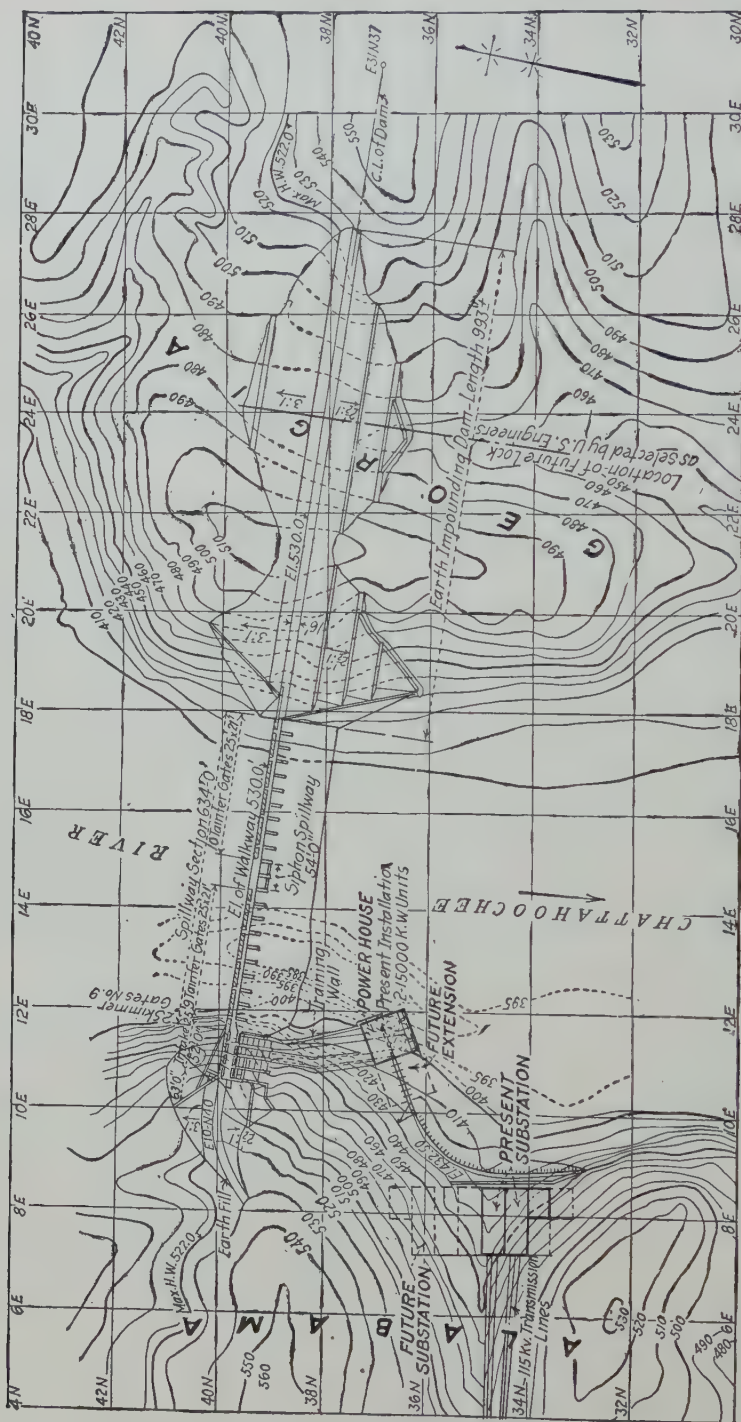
Bartlett's Ferry development, general plan. (Courtesy of Stone and Webster Engineering Corporation.)
